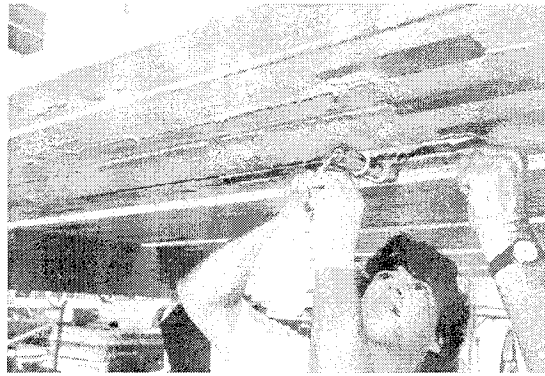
Adhesive Bonding of Prefabricated Composite Strips
